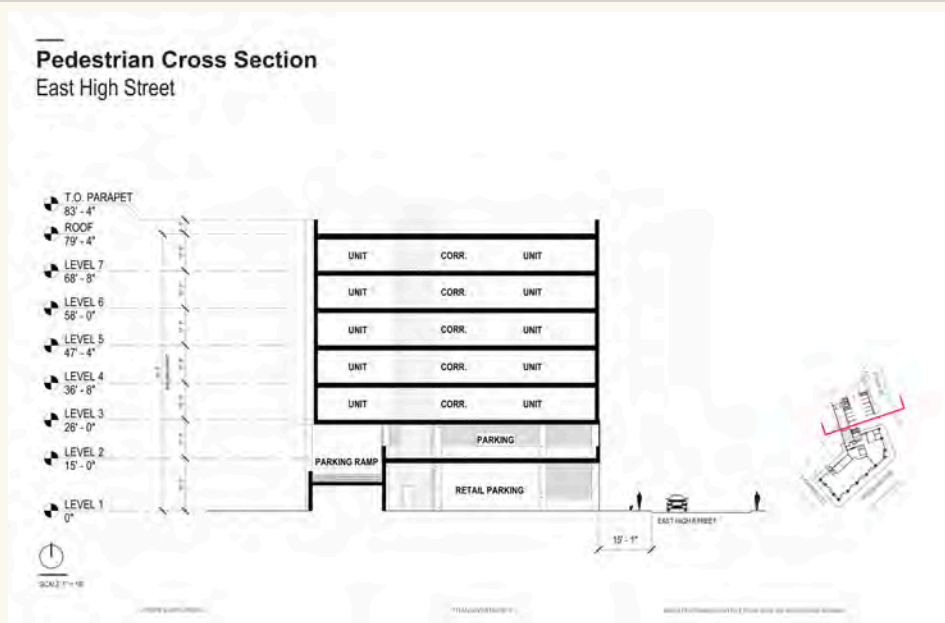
East High Street section — podium parking tucked behind the retail street frontage.
